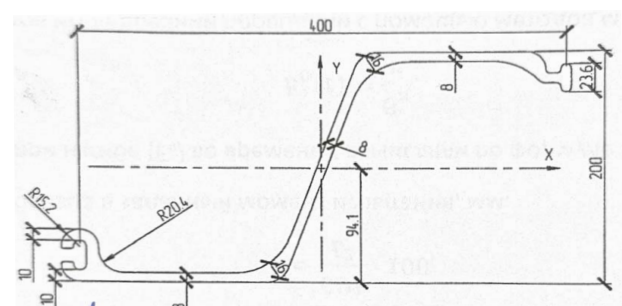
Layout of an individual element of a composite glass-filled sheet pile with a polyurethane matrix, grade ShK-200UM
